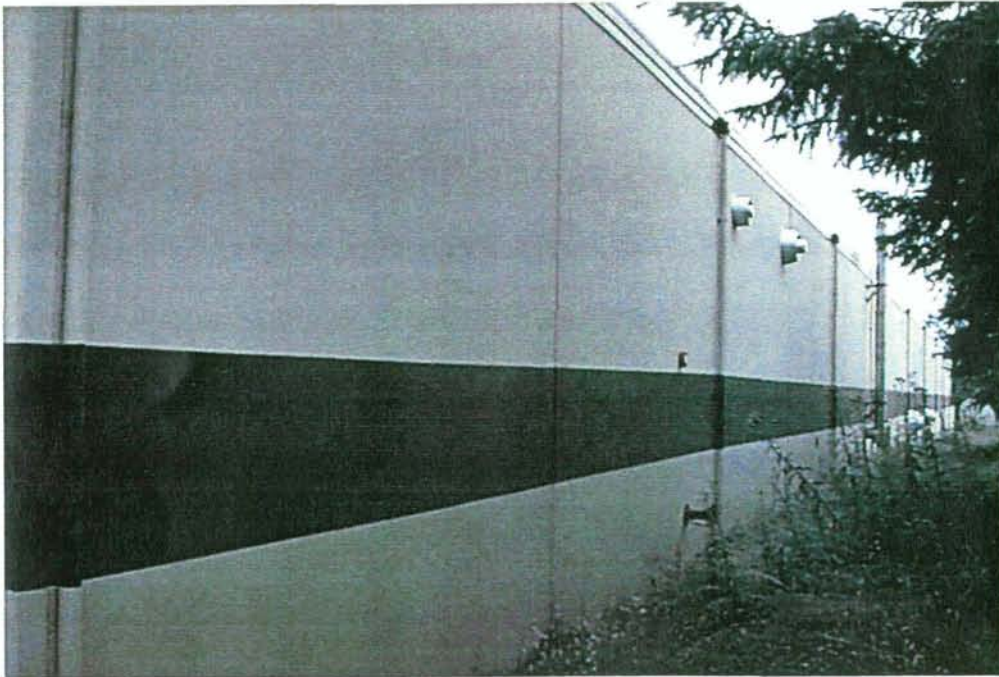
SOUTH SIDE VIEW OF FACILITY
